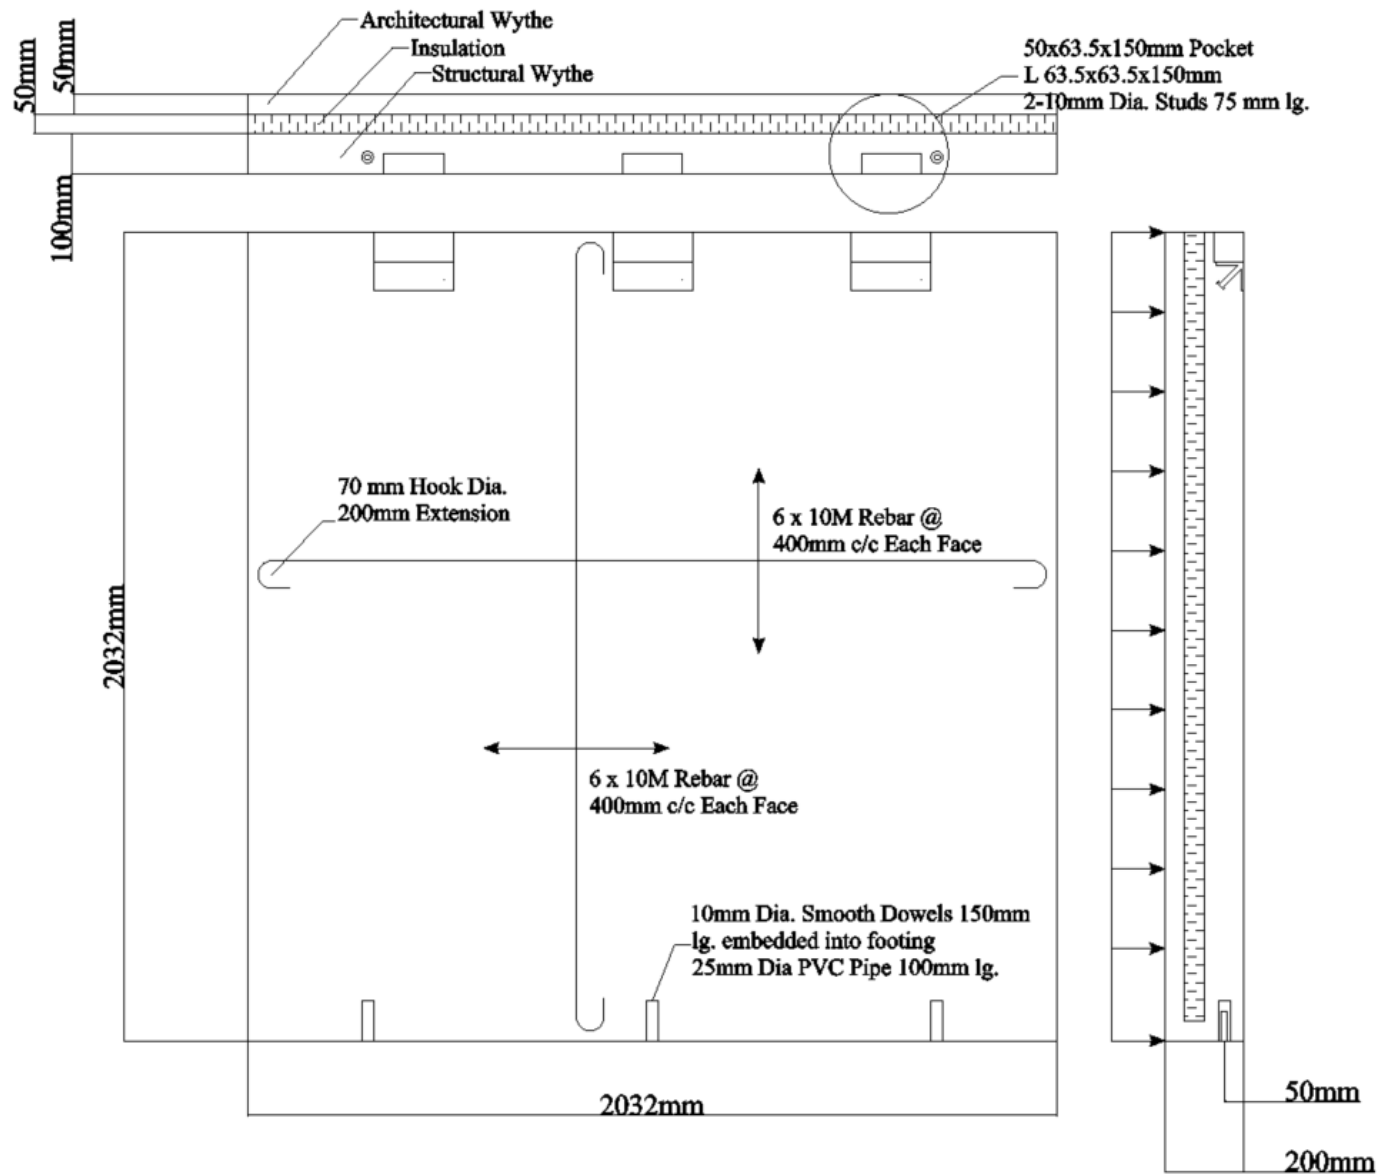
Typical Reinforcement and Connection Details for Sandwich Panels
